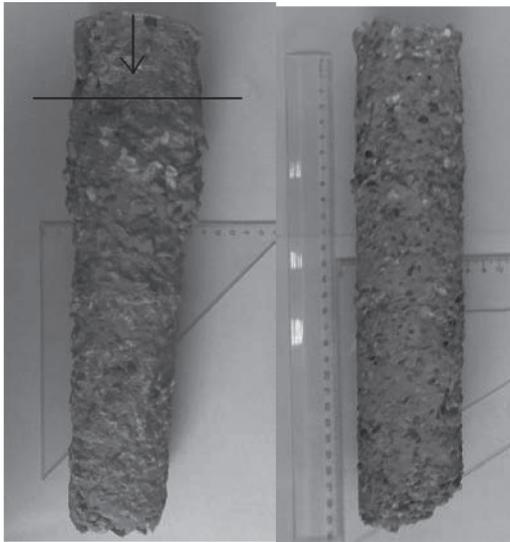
Shape of the failed stone column after the area of SC was loaded; the whole area of the SC and surrounding soil was loaded (equivalent area).
